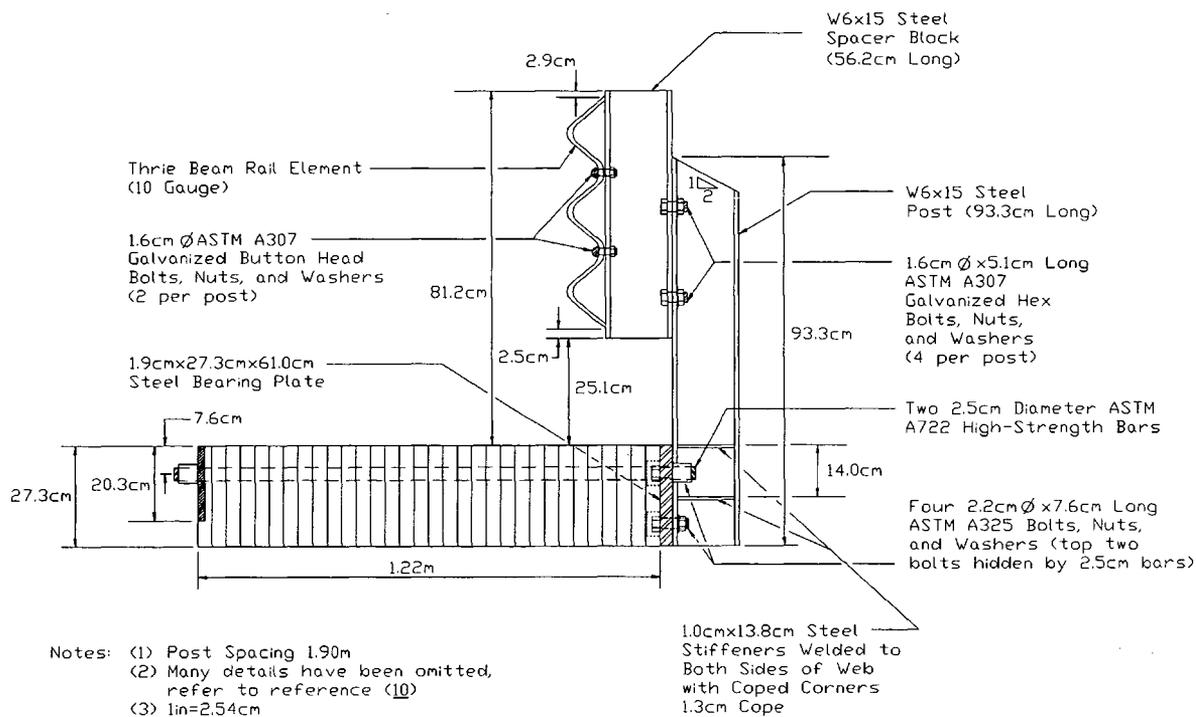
Single steel thrie-beam bridge railing, or steel system.
